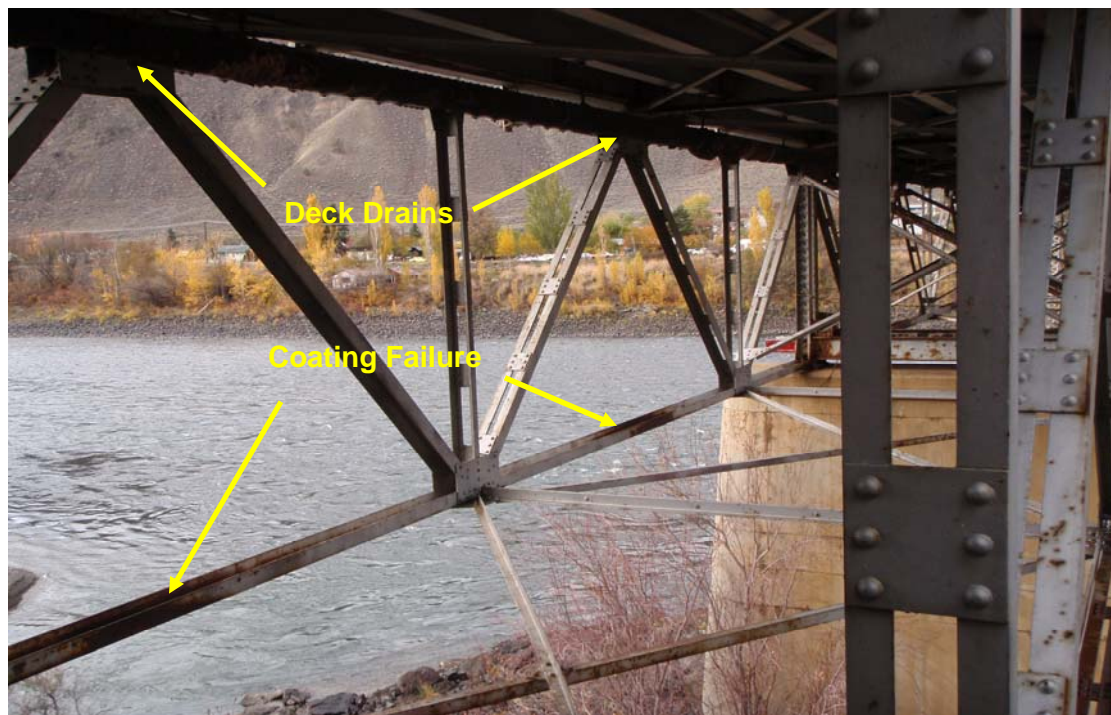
Coating Failure of Bottom Chord from Deck Drain Above
